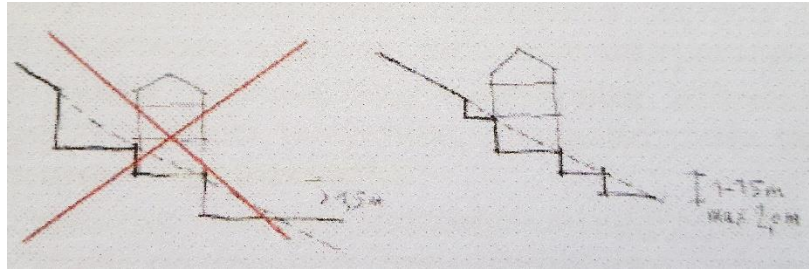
Design guidelines- retaining walls (Source: Lalosevic, 2010)
